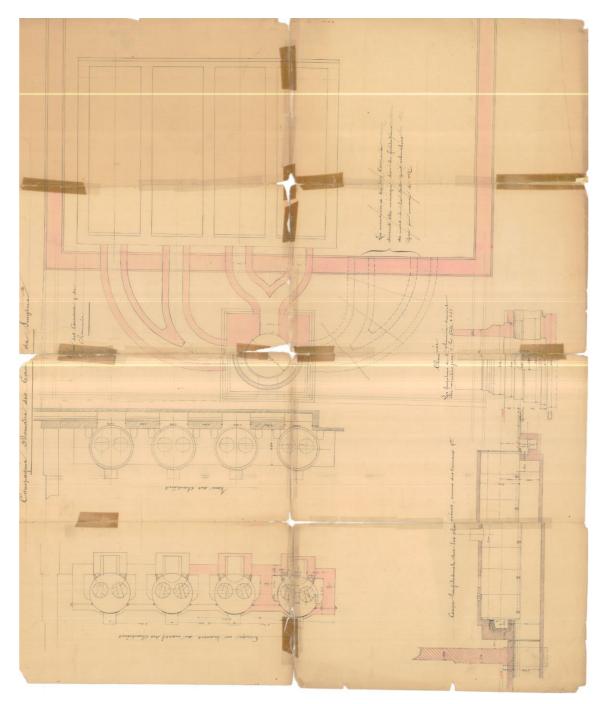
Archive document of Halkapınar Water Pump Station (Original Boilers Plan&Sections in 1898)
